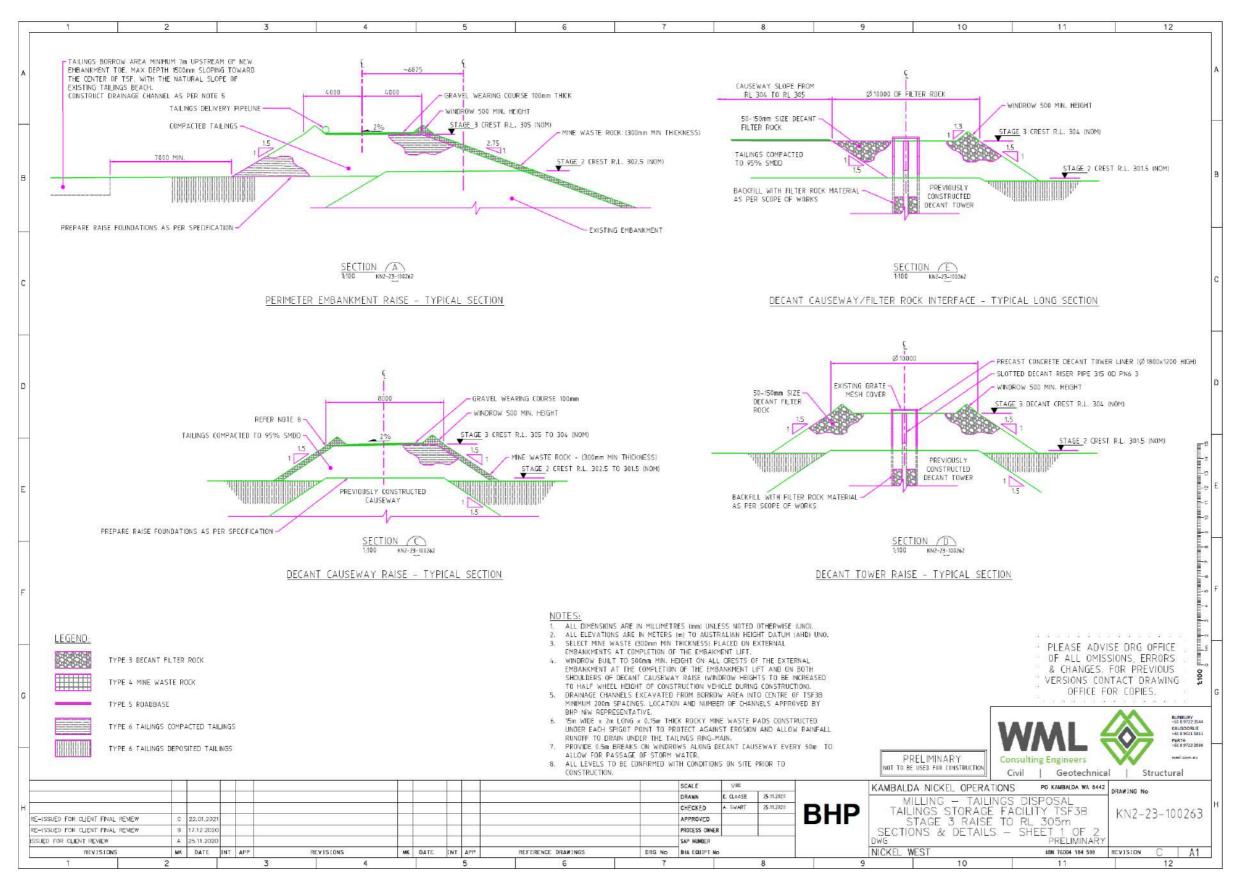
Construction details for TSF 3B Stage 3 raise to RL 305 m.
